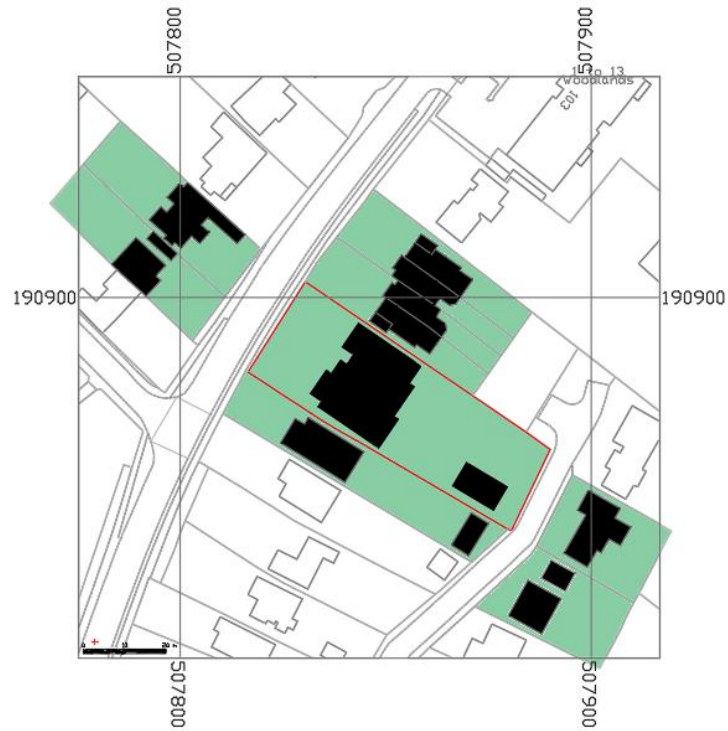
Site and Built Form Areas of no.119 Ducks Hill Road and immediately adjacent and opposite neighbouring dwellings.
